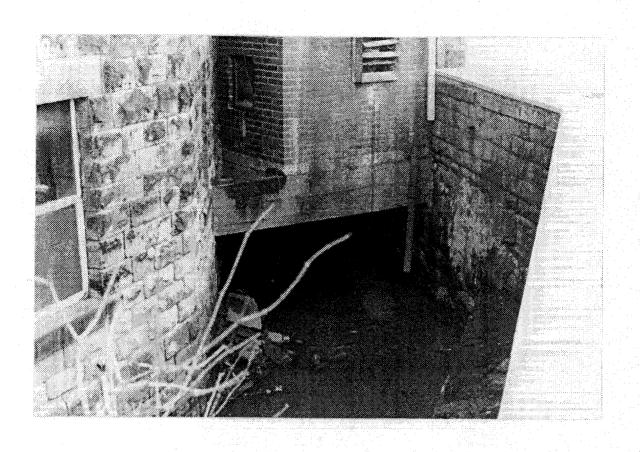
CULVERT No.11 (Inlet above - Outlet below)
